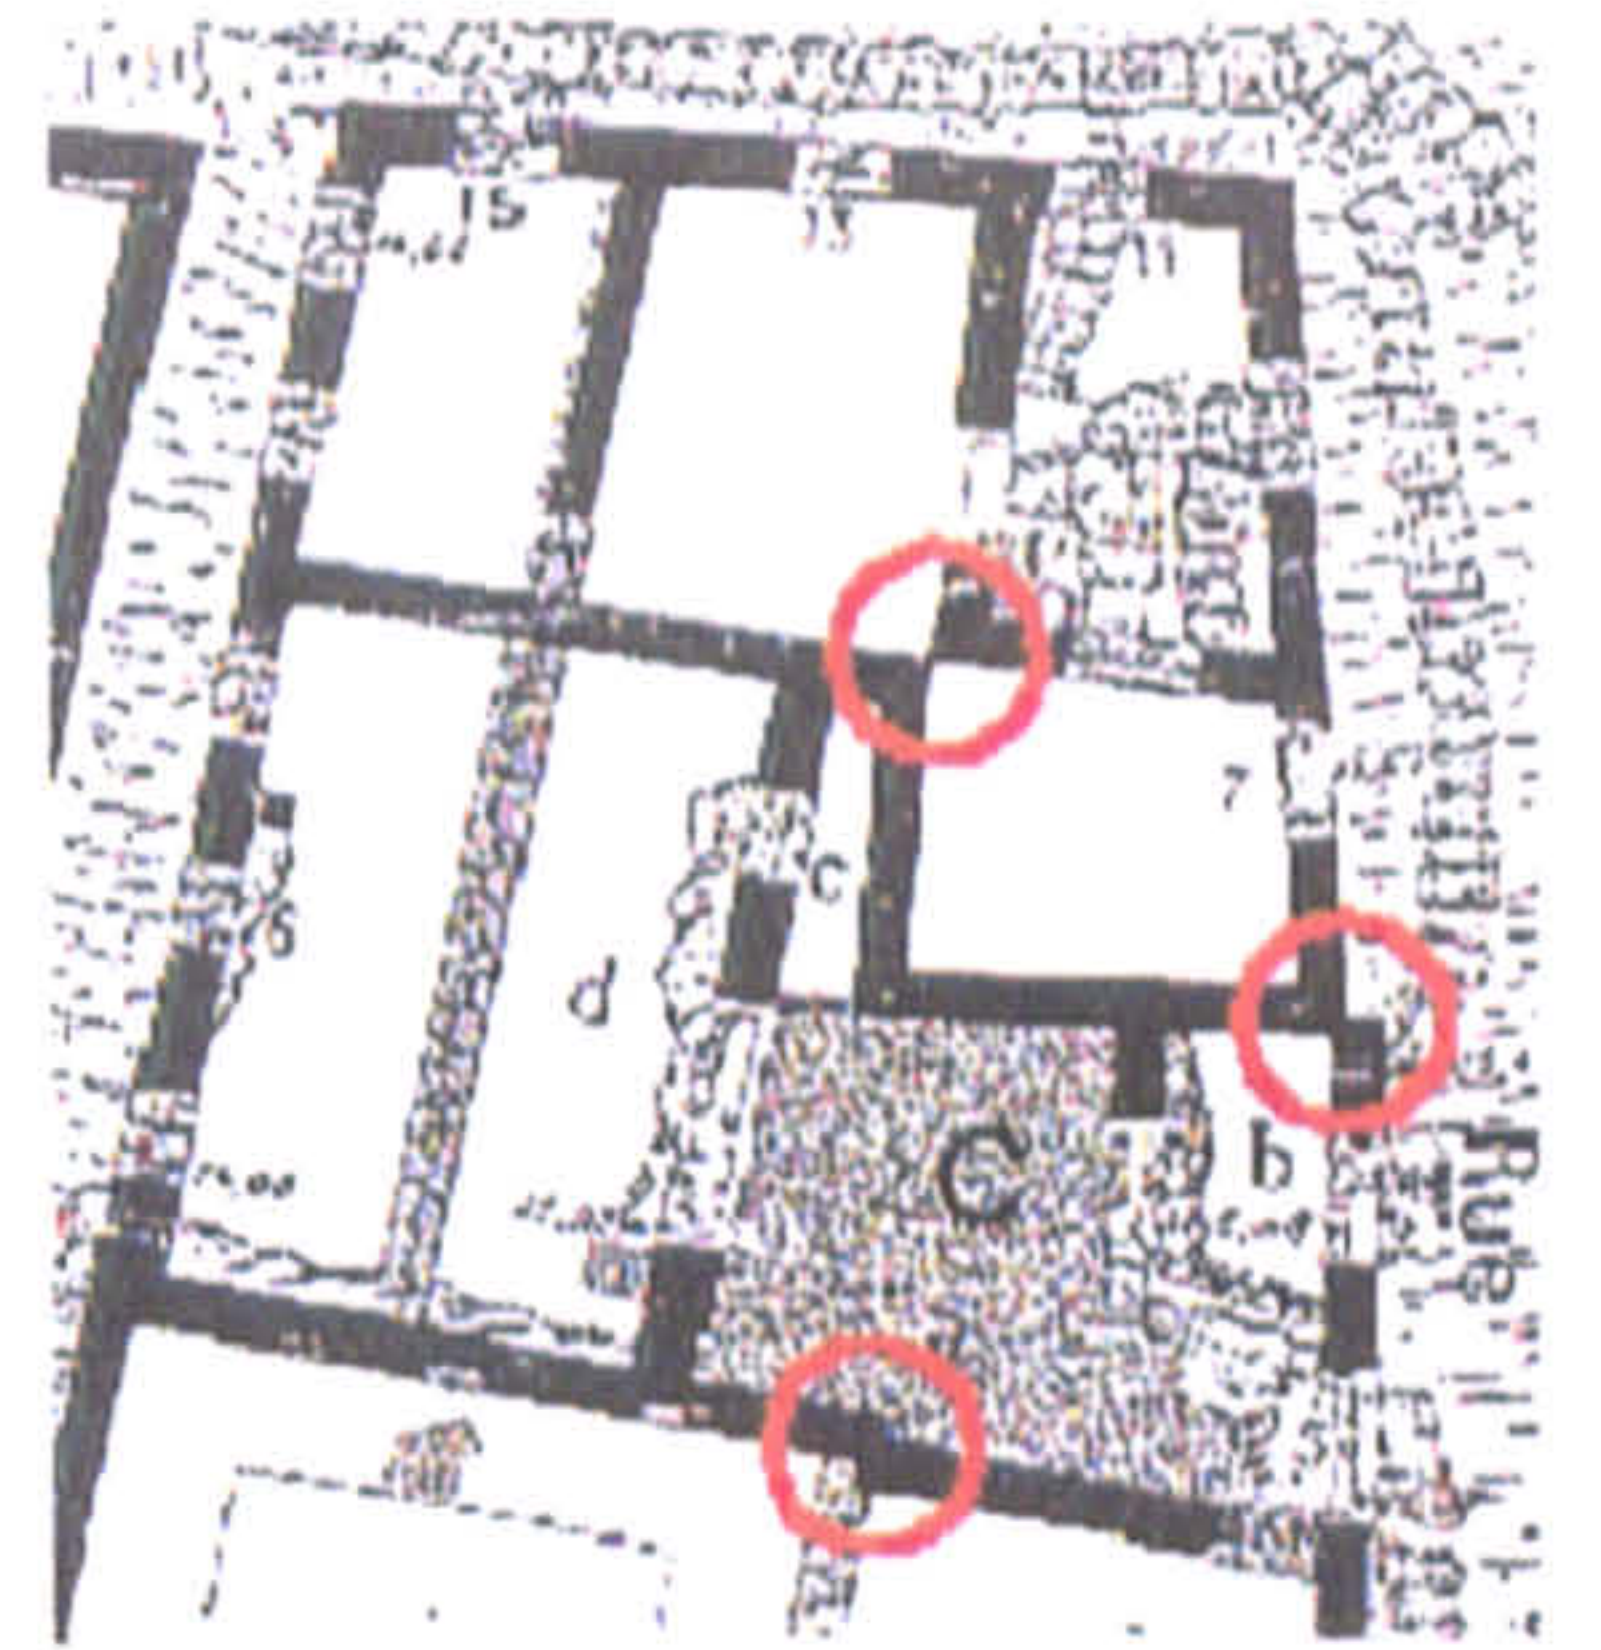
Unusual wall alignments between house IV C and adjoining properties.
